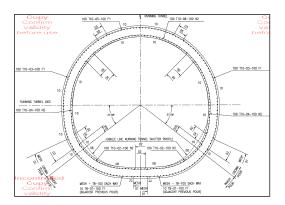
EASTBOUND RUNNING TUNNEL SECTION. EXTRACTS FROM LUL DRAWING 104-B-05-12-602-0
